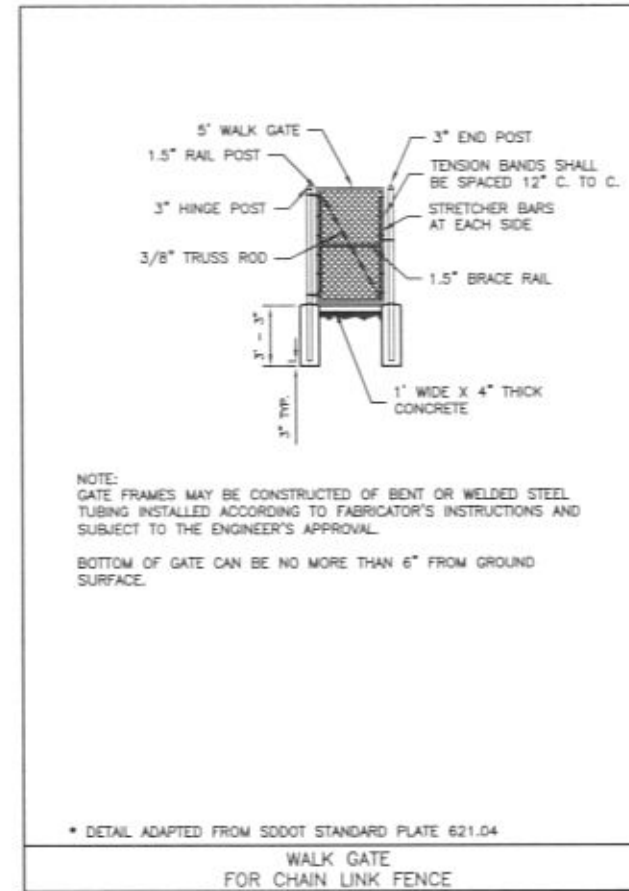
DETAIL ADAPTED FROM SDDOT STANDARD PLATE 621.02
